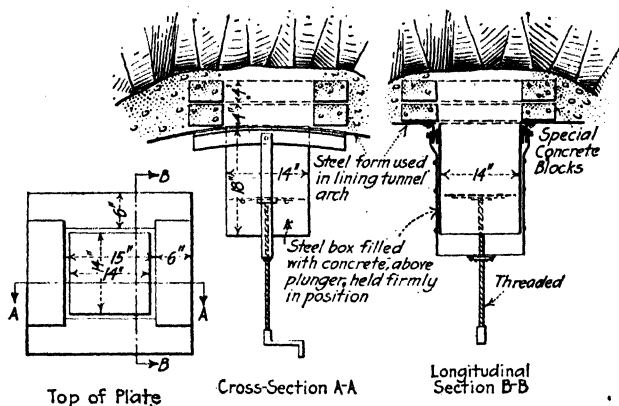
Catskill aqueduct. One method of placing last concrete in key of tunnel arch at a closure.
